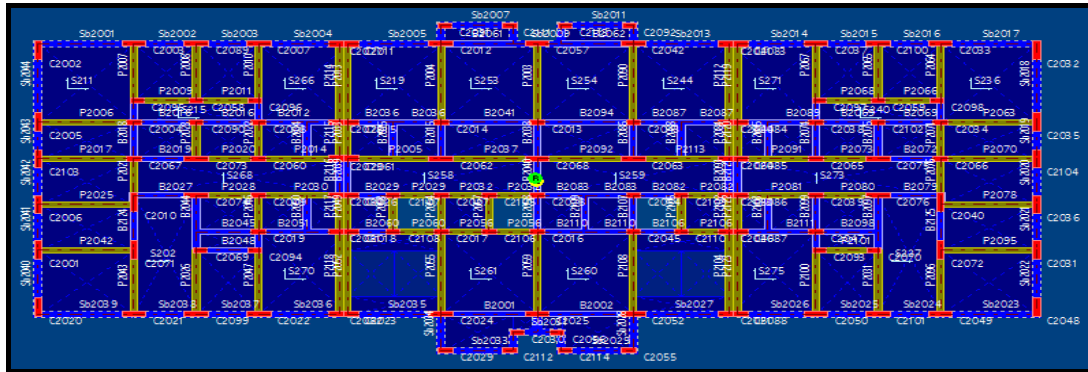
Plan of Twenty Stories and Tunnel Formwork System
